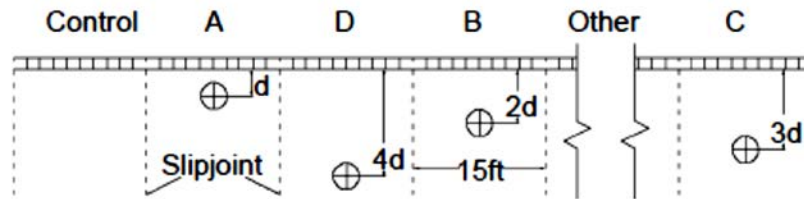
Test section (plain view) of the four individual piles (Pierson et al. 2009)
